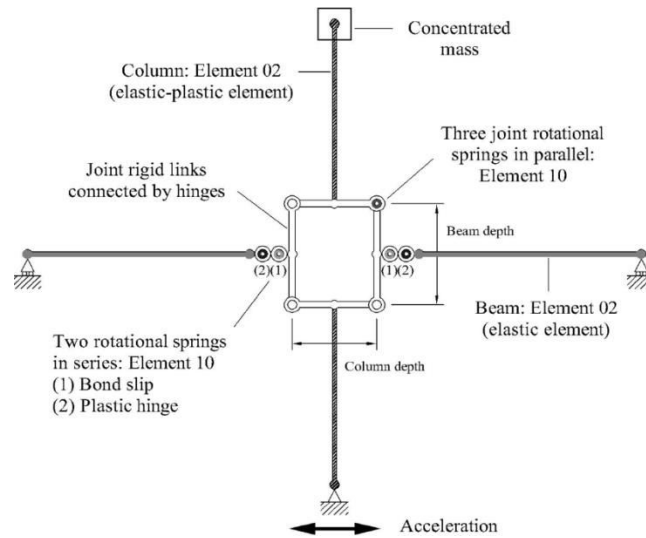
4: Alternative beam-column joint model adopted by Shin, *et al.*, 2004
